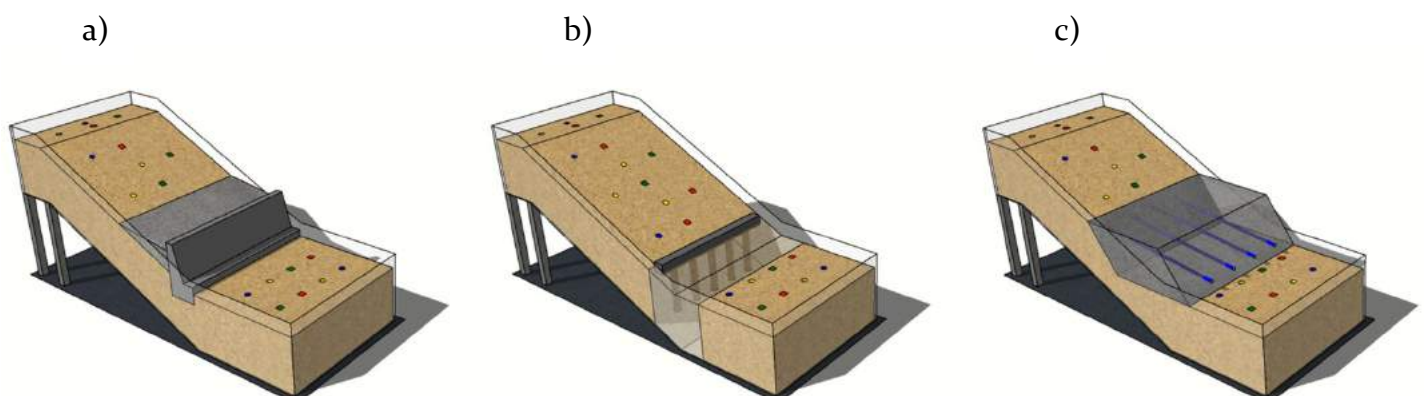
Physical model with different remediation constructions – a) retaining wall; b) pile wall; c) buttressing with drainage systems.
